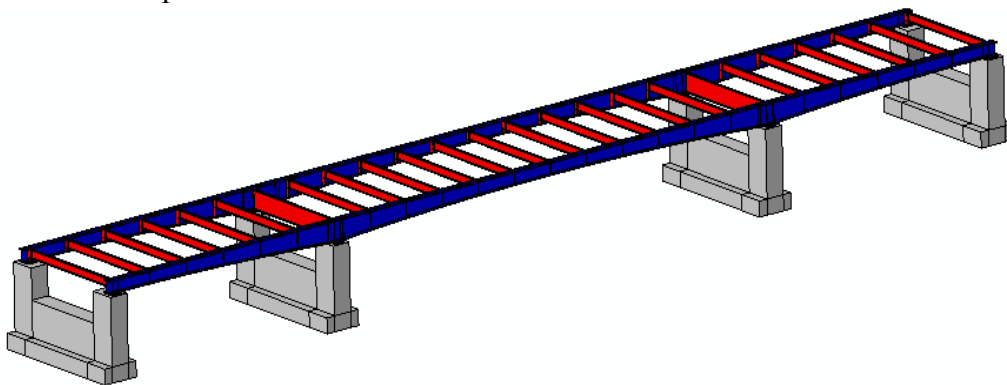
Primary structural system of the bridge: the steel grid consisting of the H-beam girders and crossbars along with the concrete piers
